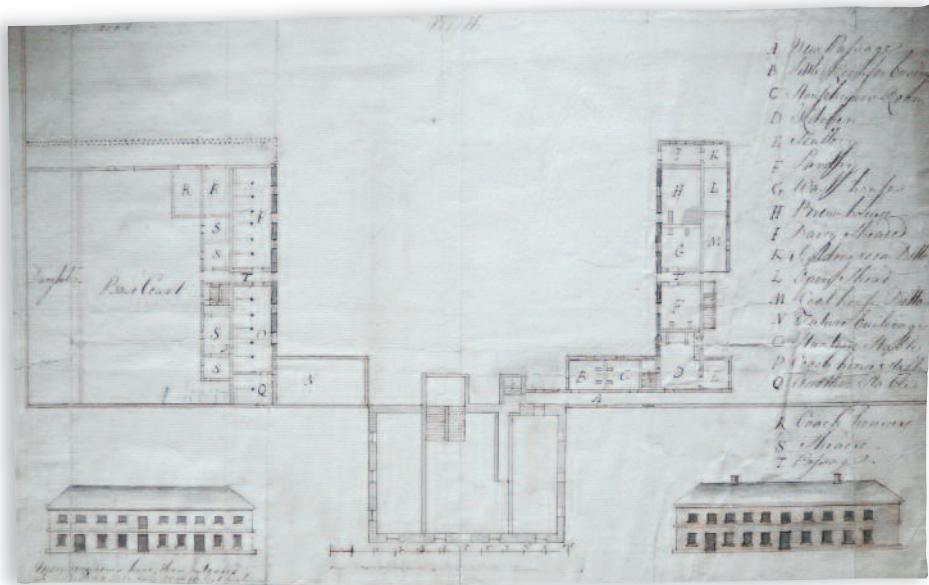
Capheaton Hall: undated proposal plan, probably earlier than the plan marked '1754' (Fig. 3)
